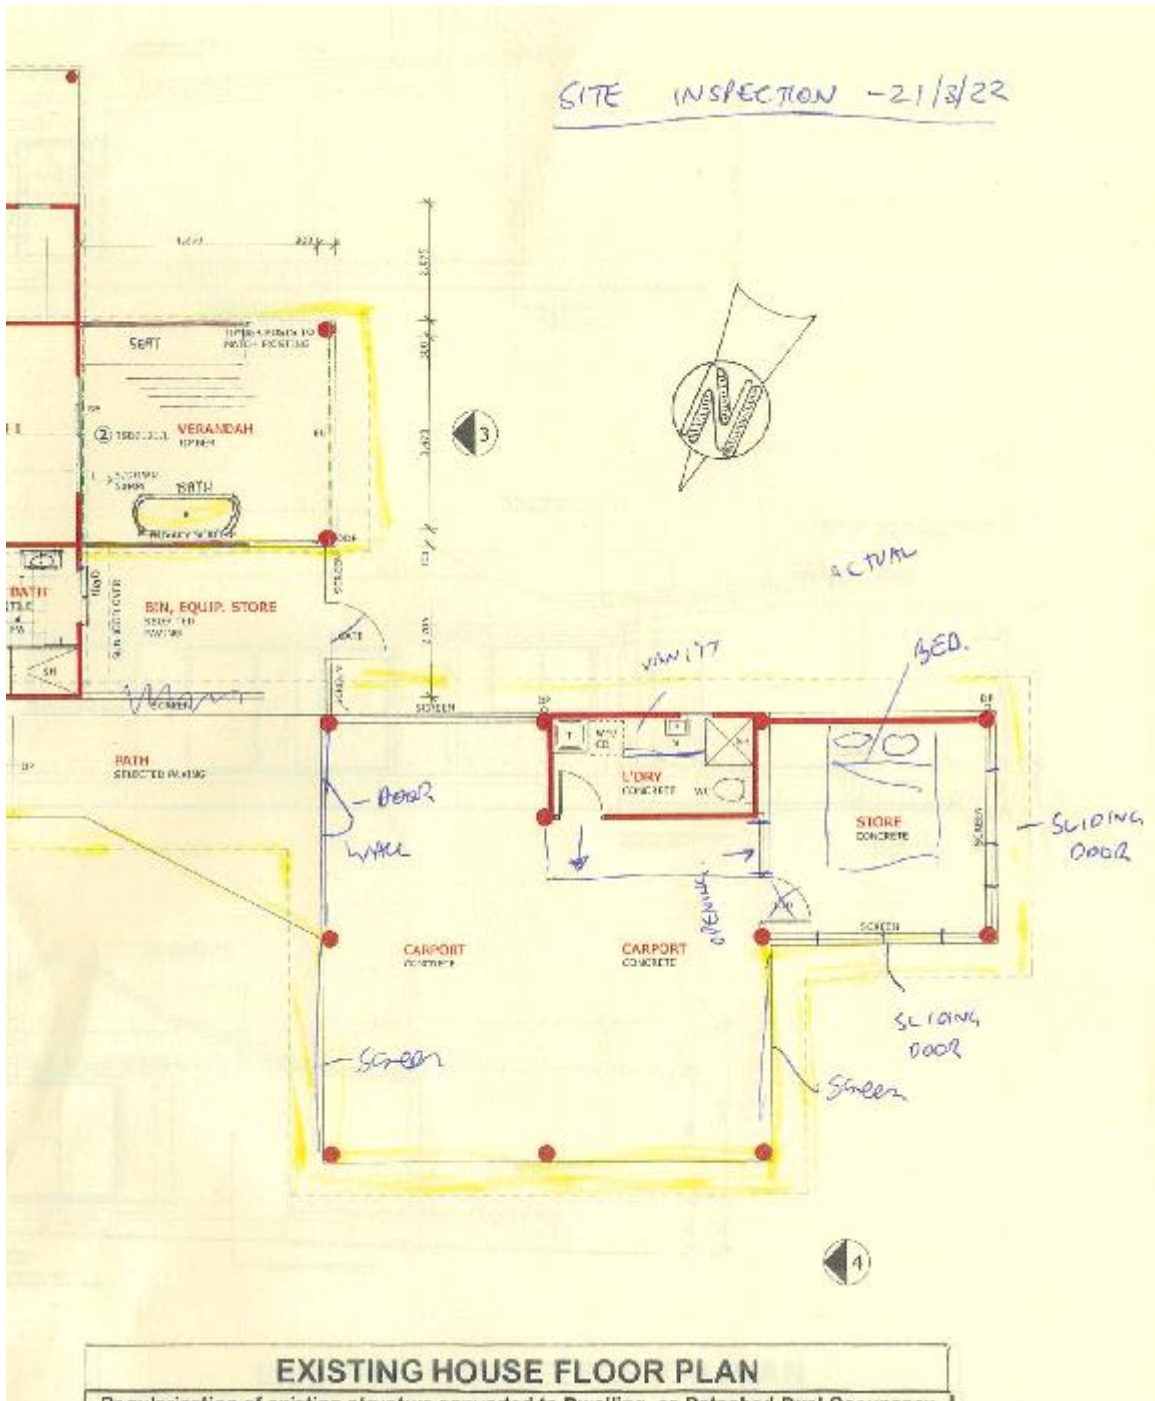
Site plan showing inconsistencies noted during site inspection.
